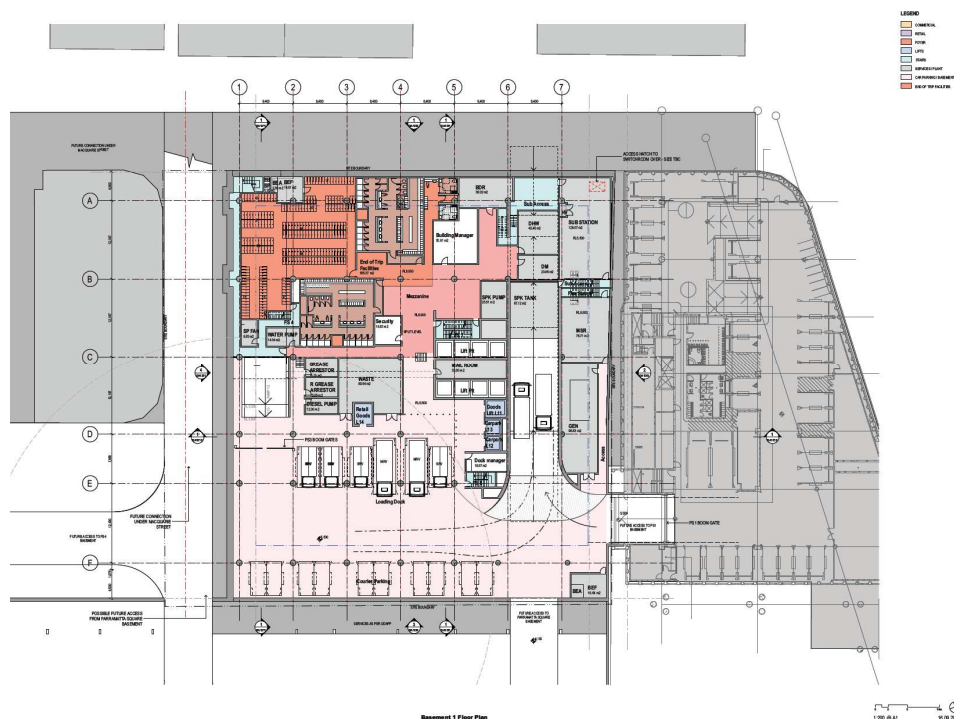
Basement 1 Floor Plan (Source: FJMT, Drawing No. DA1012, 16.09.15)
